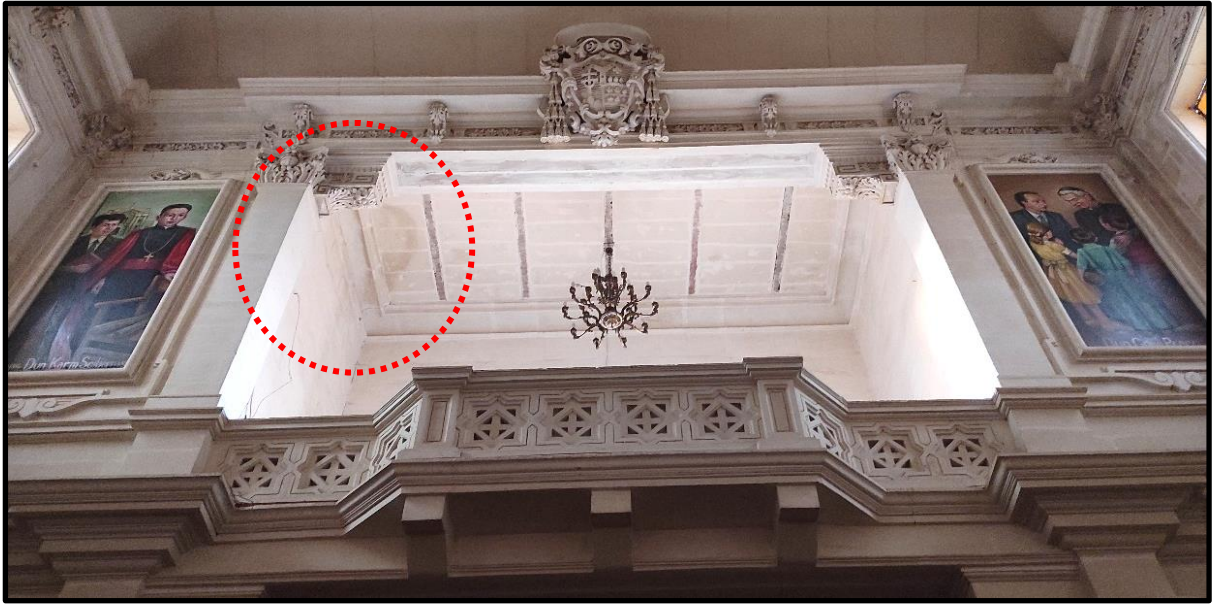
Chapel – Slab above balcony – rusted steel beams, water stains
